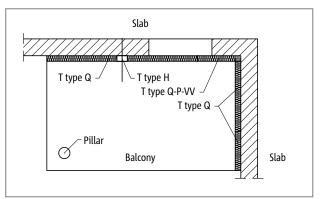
Schöck Isokorb[®] T type Q, Q-P-VV: Balcony supported on two sides with pillar and positive shear forces
